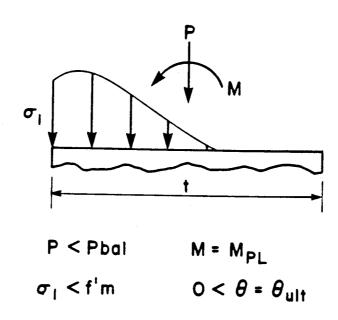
Internal Stress Distribution on a Wall Cross-Section Having a Compression Failure (Ferguson, 1979)
